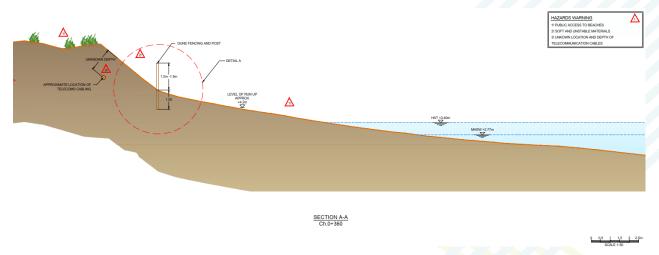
Cross-section of extent of fencing at Lower Town Beach (HR Wallingford, 2022)
